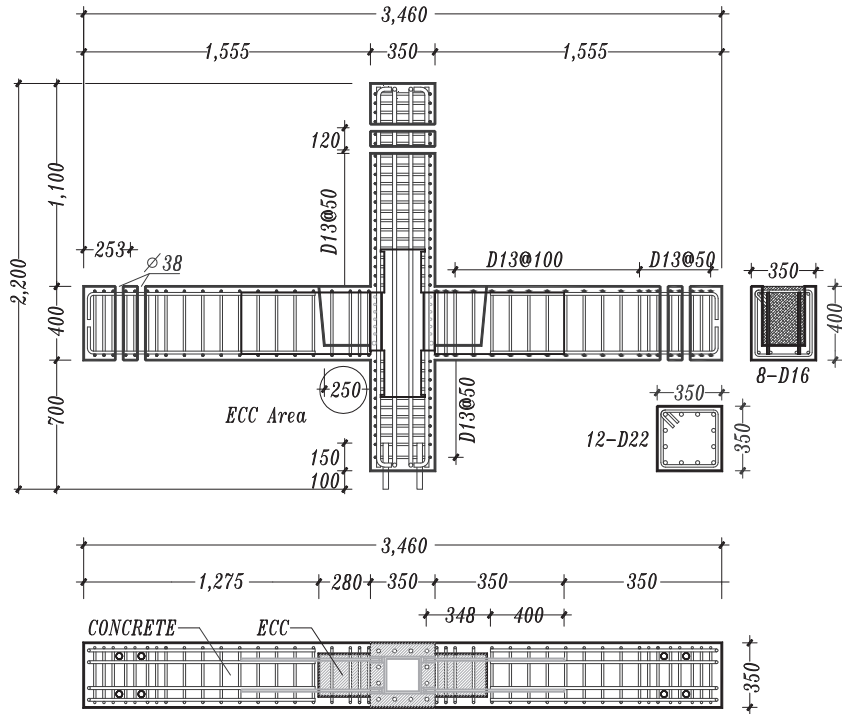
Details of PC-I-25 Specimen (Unit: mm).
